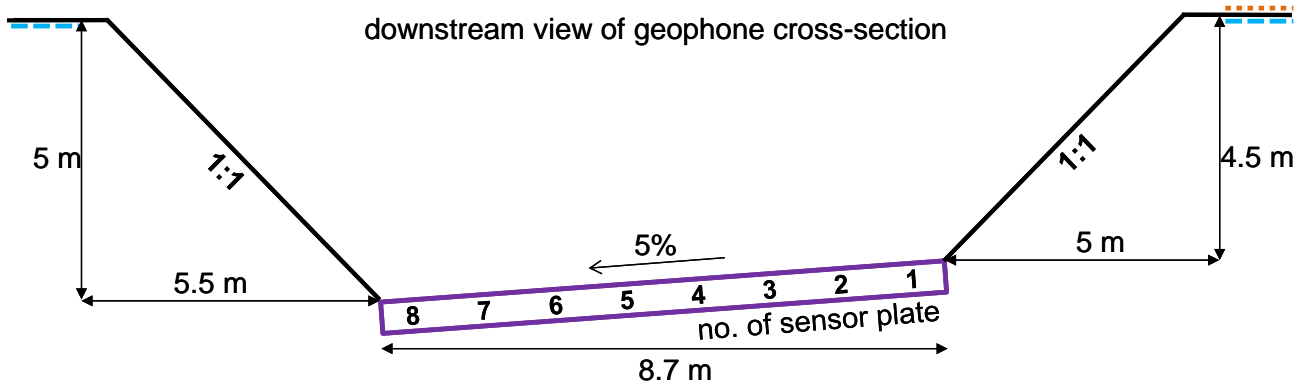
Schematic stream cross-section at the geophone measuring site in both Fischbach and Ruetz. The steel-concrete pillar is located downstream of the sensor plate no. 5. The sill with the steel plates is inclined towards the left bank to improve the resolution of the flow gauge measurements at low discharges. On the banks, the dotted horizontal line indicates the paved local road on river right side at the Fischbach, and the two dashed horizontal lines indicate the graveled parking lot on both river sides at the Ruetz.
